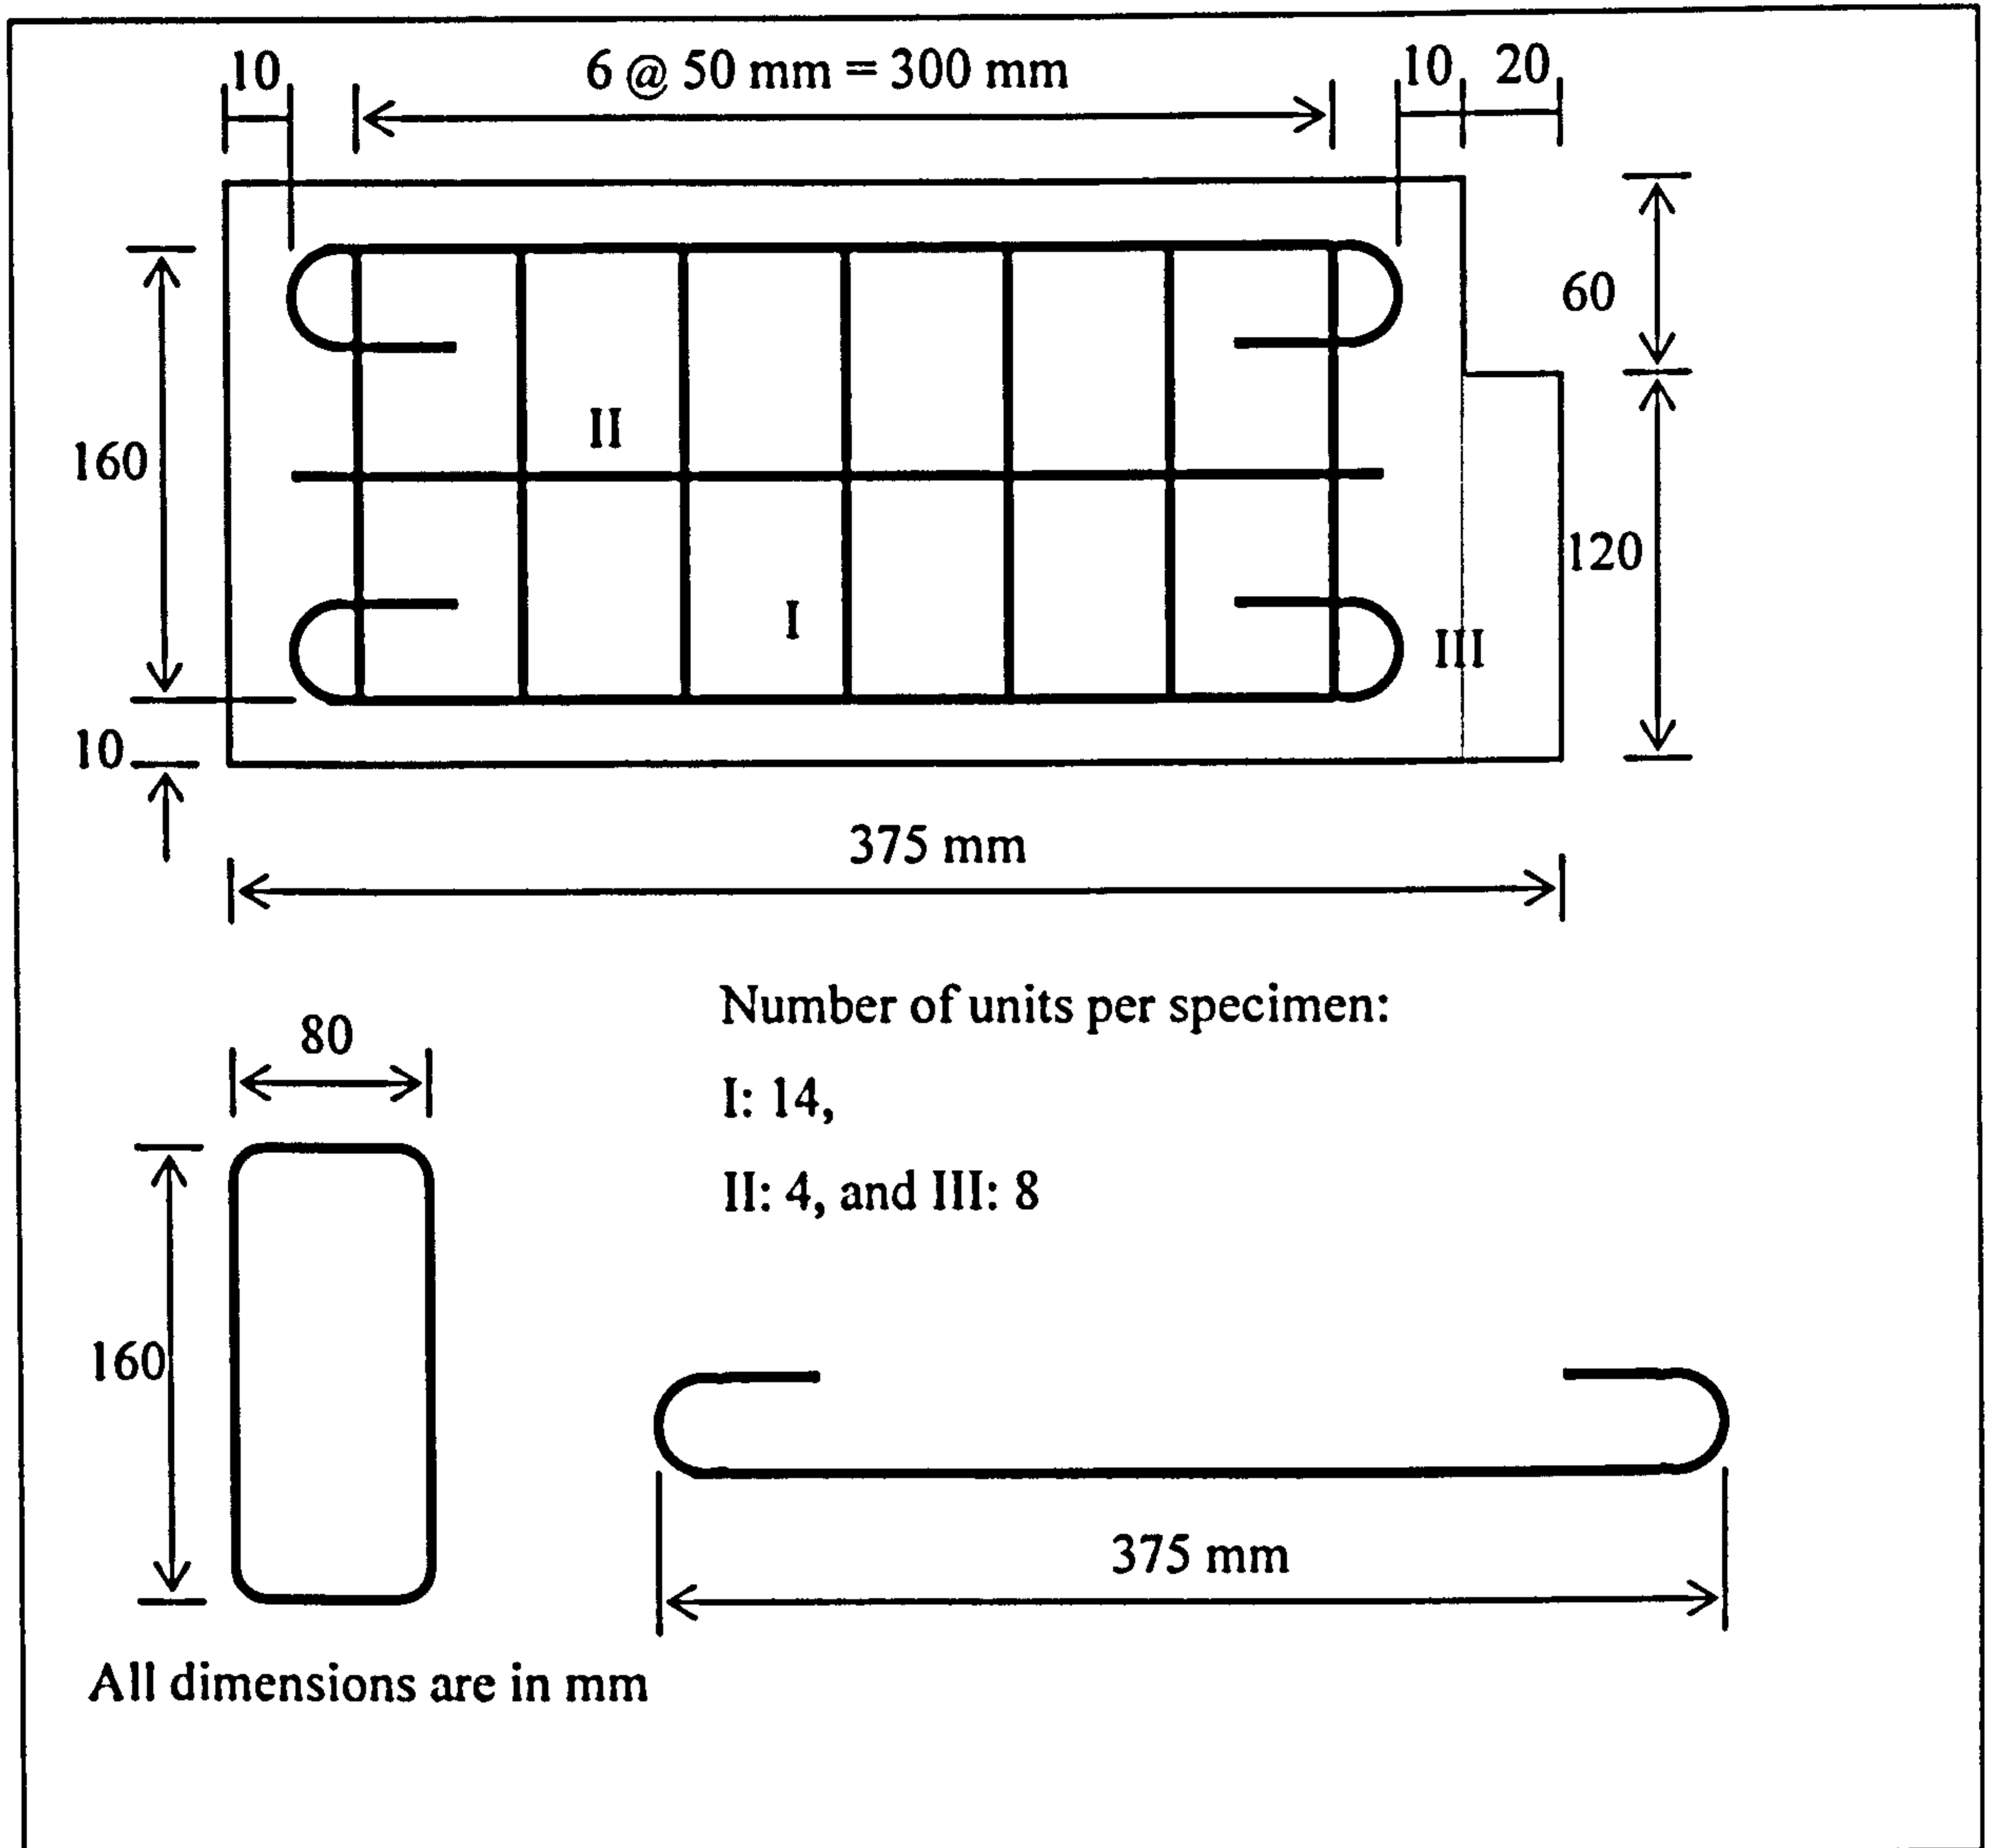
Auxiliary and shear steel reinforcement used in joint-beam specimens
